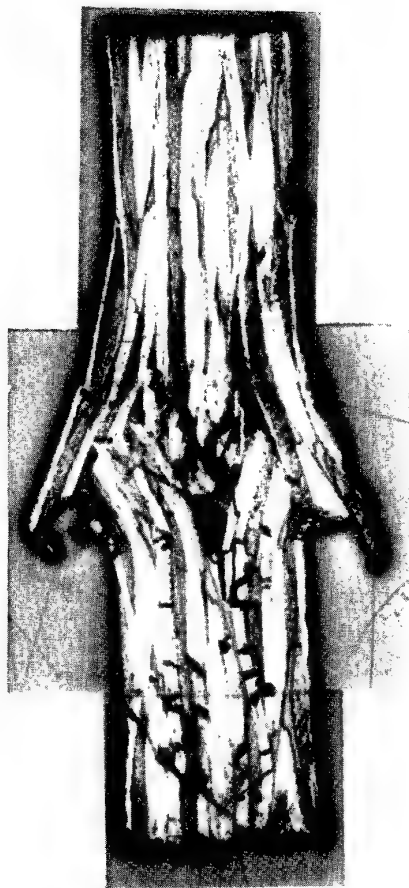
Bearing Section at Hole Edge for 45° Bearing Sample
